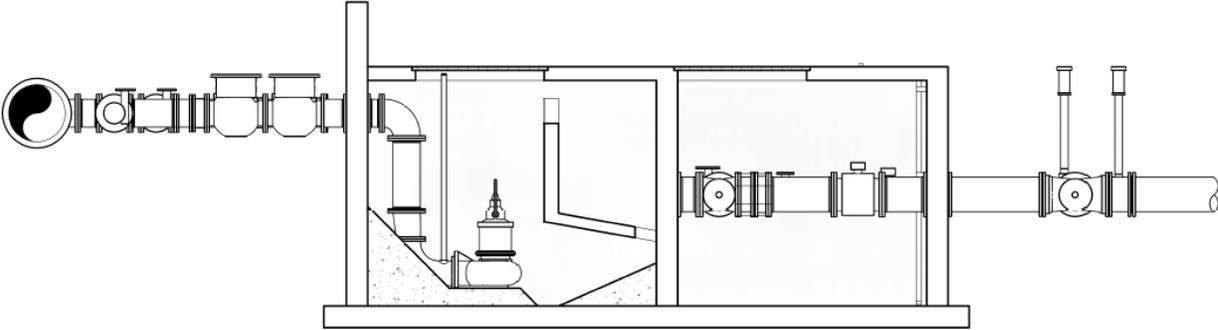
Proposed Pump Station for Alternative 4 – Section View
